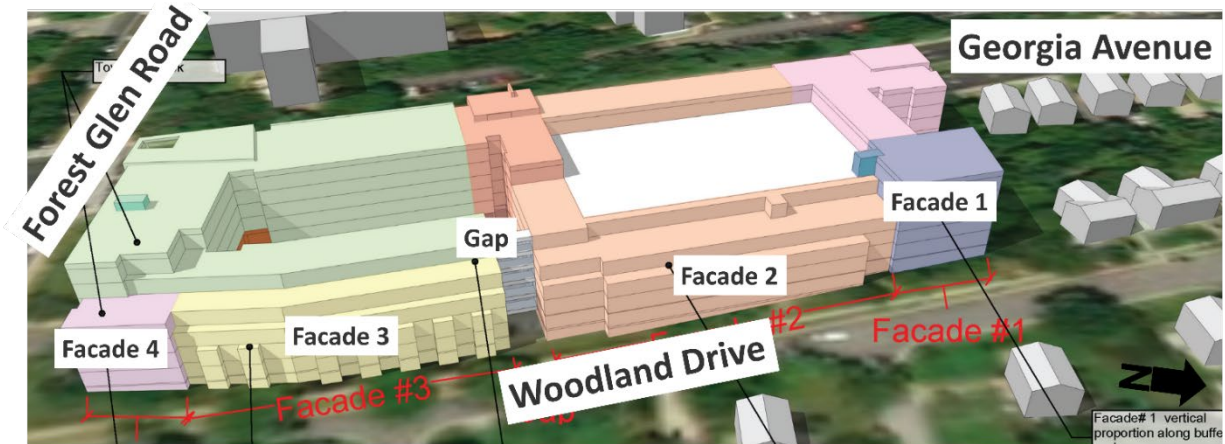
Sketch Plan Diagram of Woodland Drive Façades to be Revised
